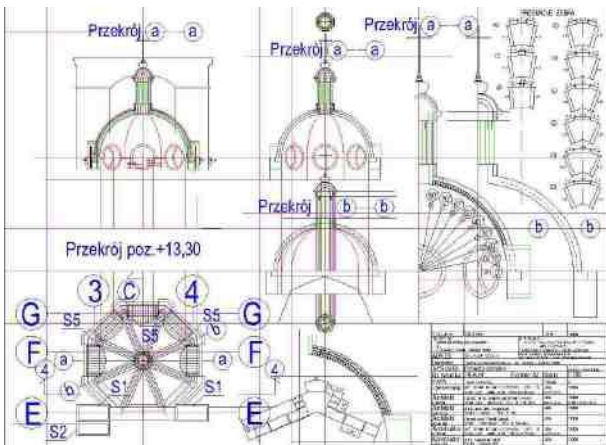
Cross-sections of masonry dome with reinforced-concrete ribs covering the octagonal side chapel.
